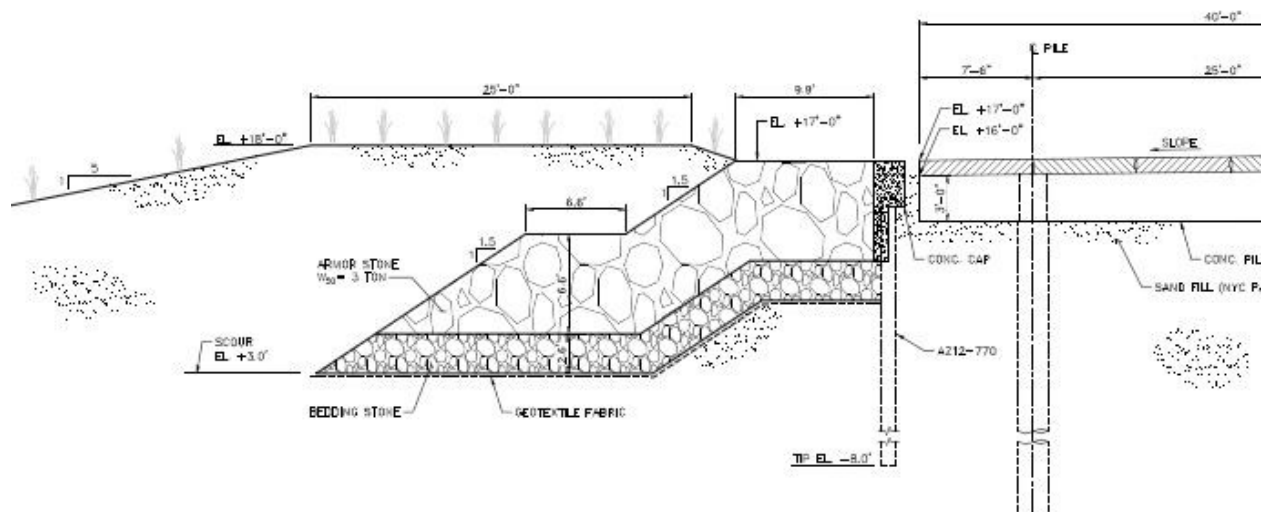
Composite Seawall Beach 19th Street to Beach 126th Street.
